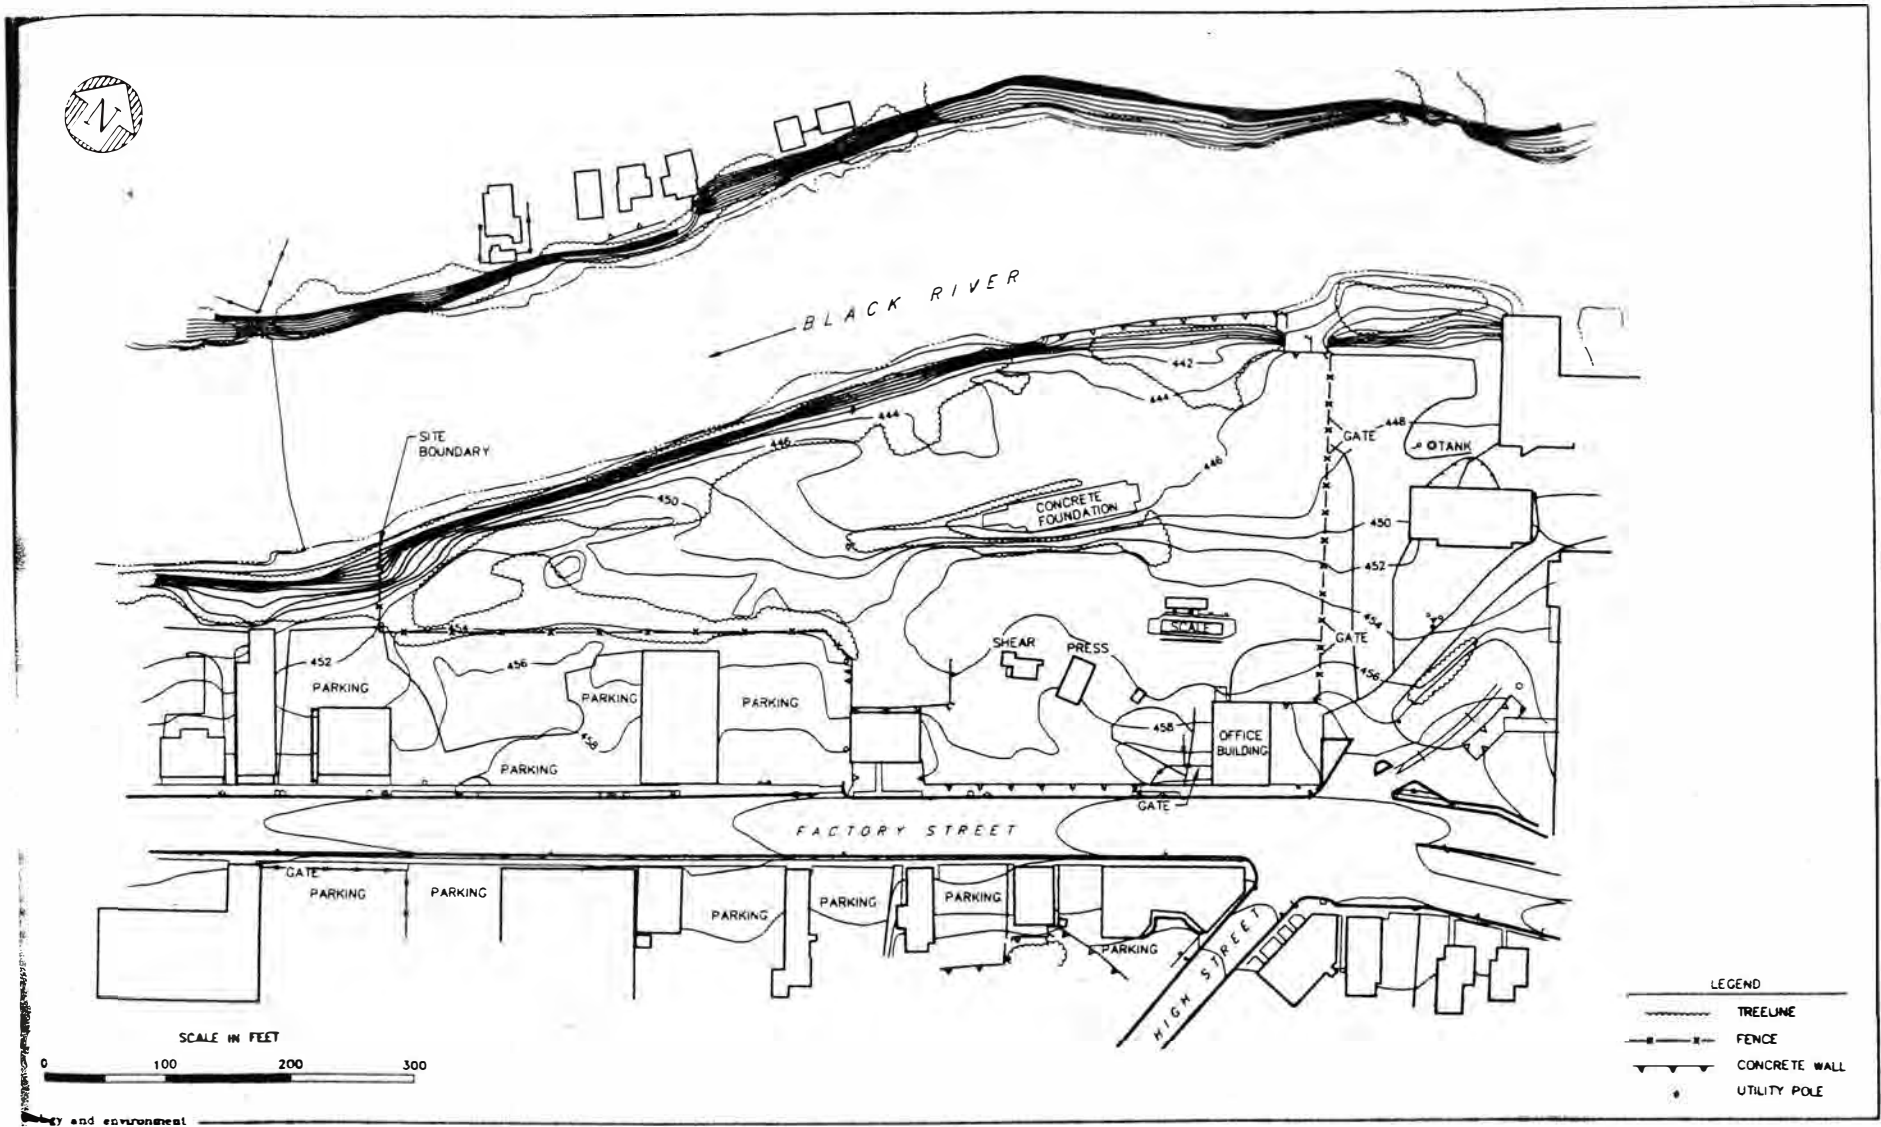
ABE COOPER SURPLUS COMPANY EXISTING SITE PLAN
